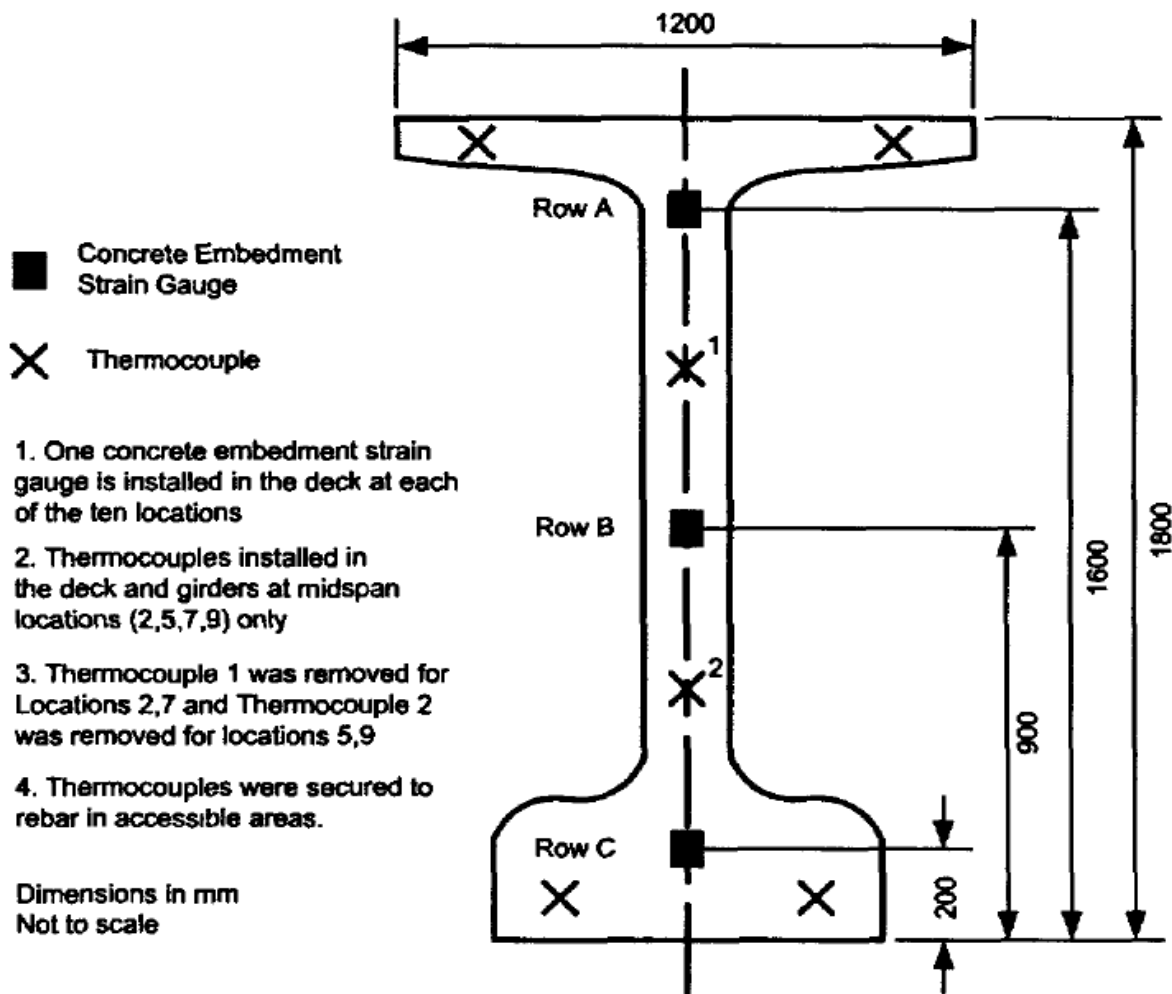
The cross-section view of the girder shows the concrete strain gauge and thermocouple installation locations (Huntley, 2009).
